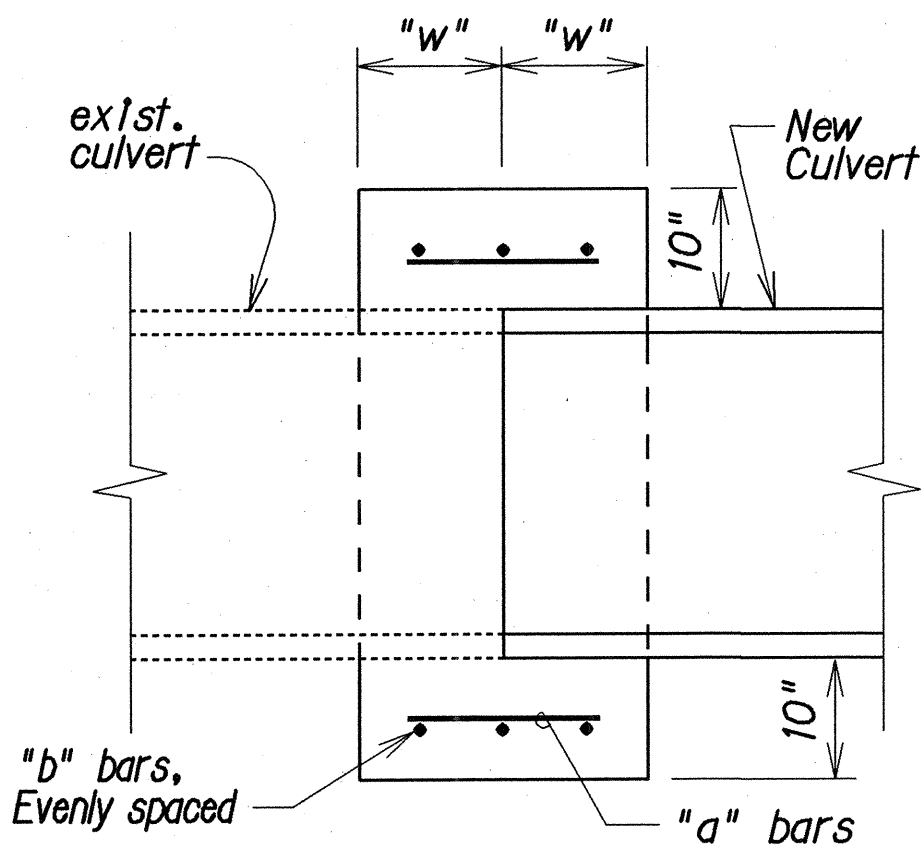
### DETAIL - TYPICAL CULVERT EXTENSION DETAIL
